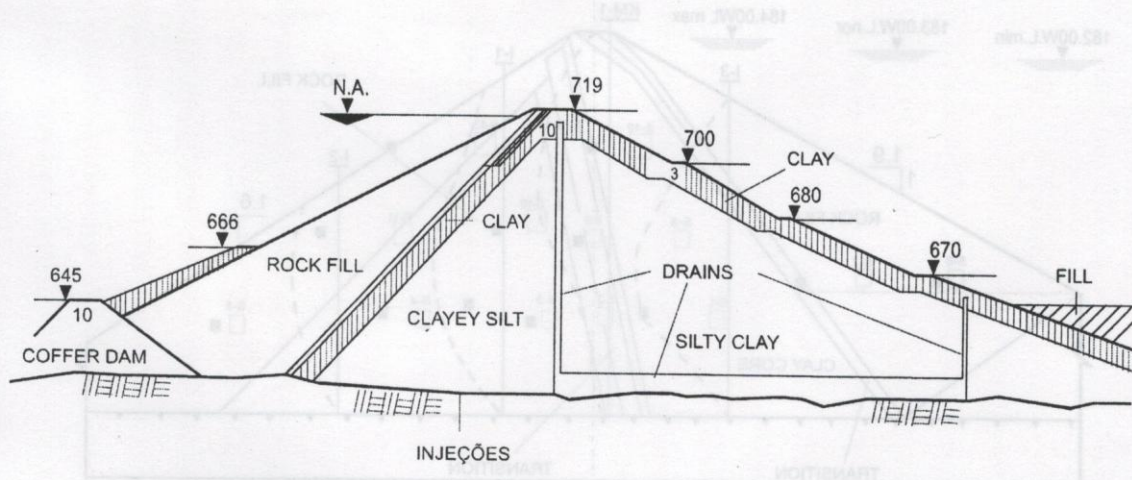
Typical cross-section of the Paraibuna Dam (Mello 1975)
